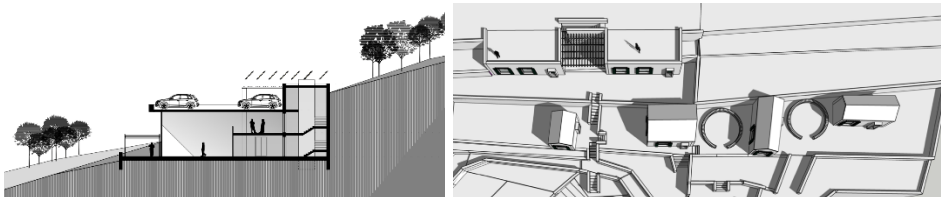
Wedding hall - cross-section: part 3 Figure 8. Renovation of old houses in sector 2.
